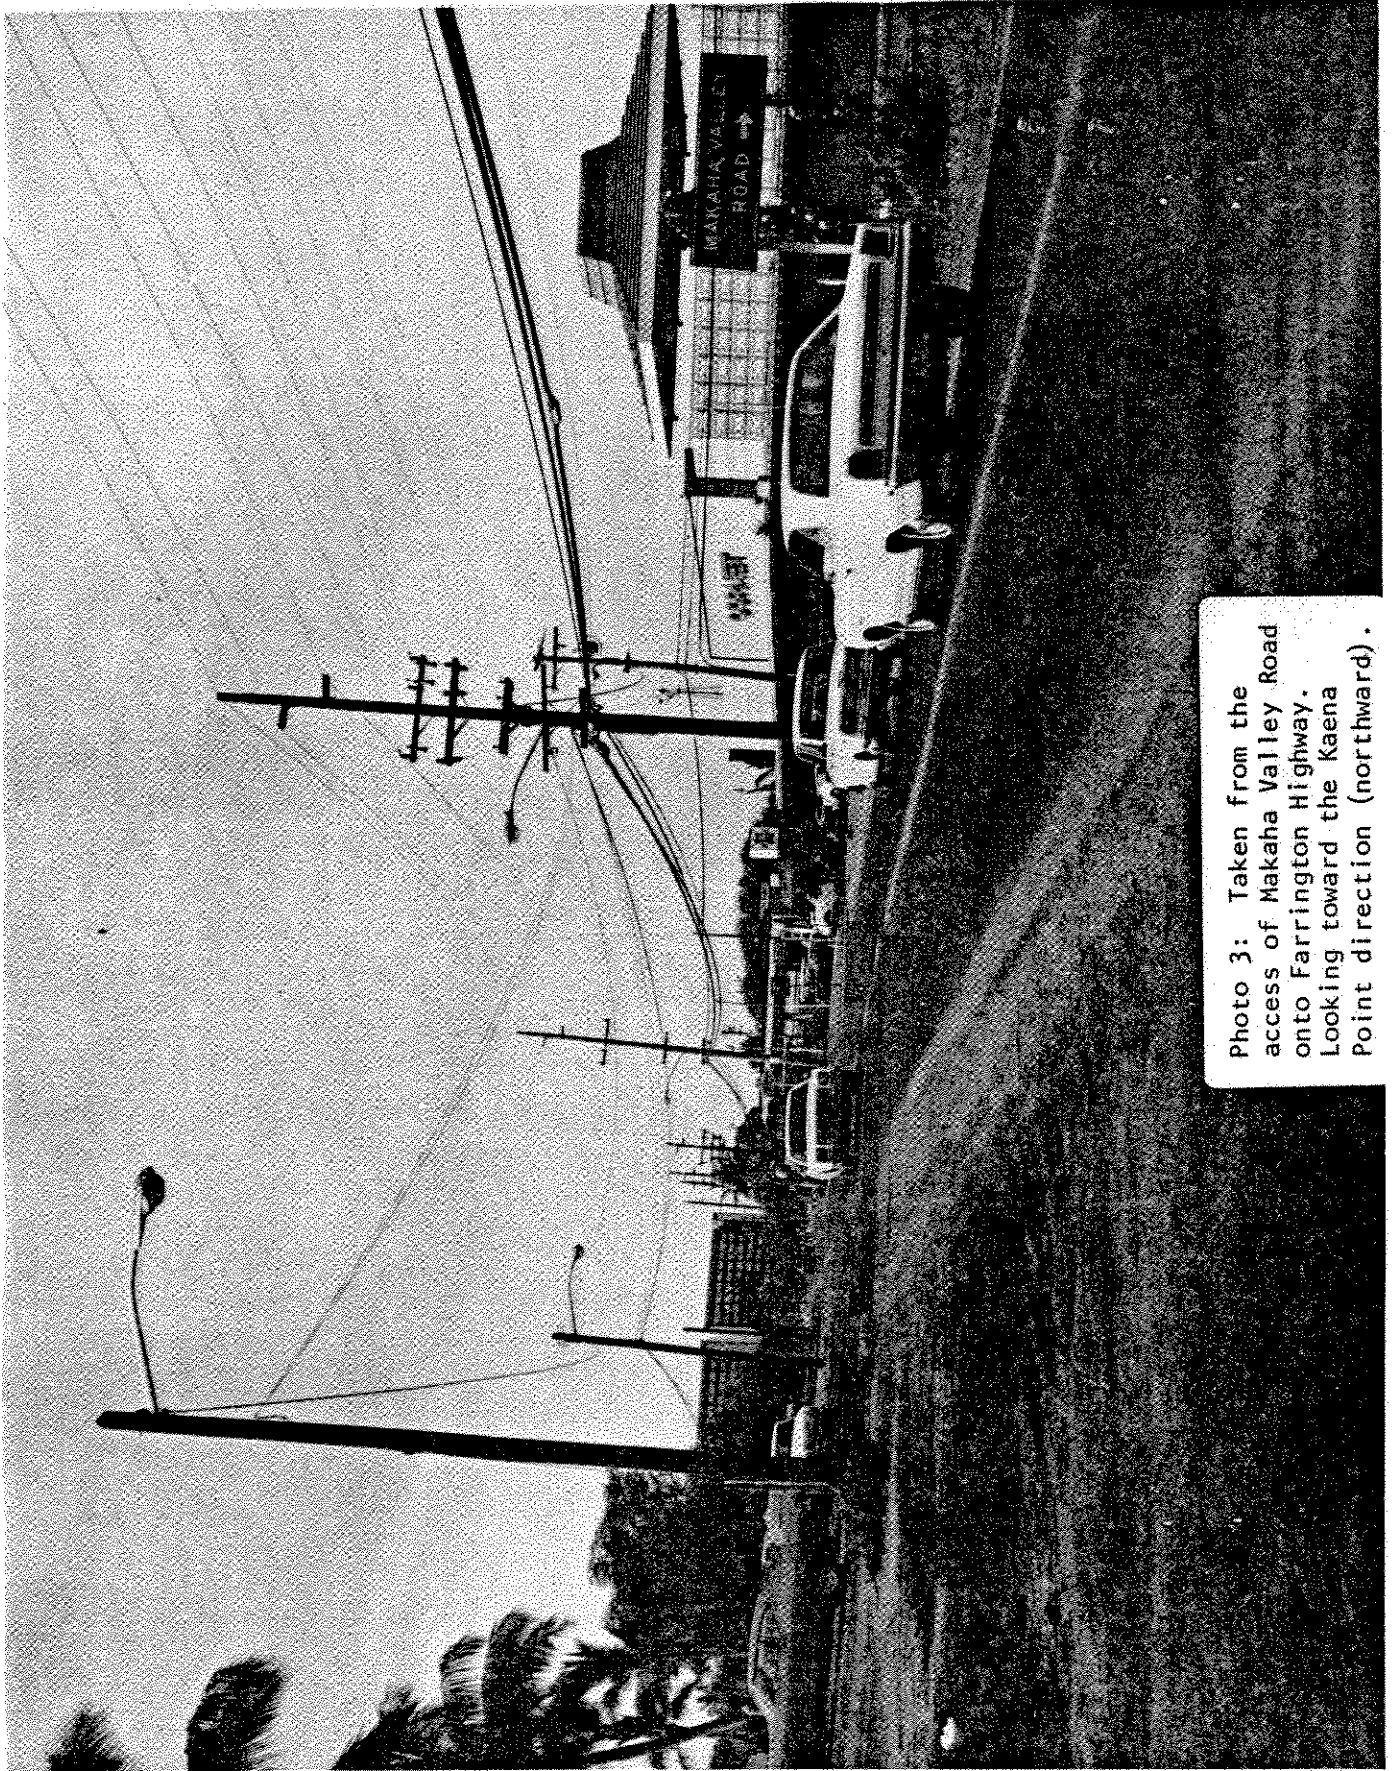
Taken from the access of Makaha Valley Road onto Farrington Highway. Looking toward the Kaena Point direction (northward).
